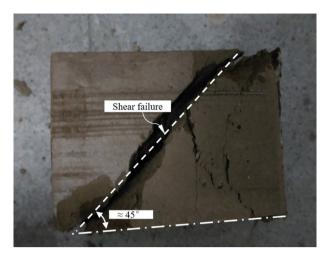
Front view of cubic specimen showing typical shear failure under compression.
